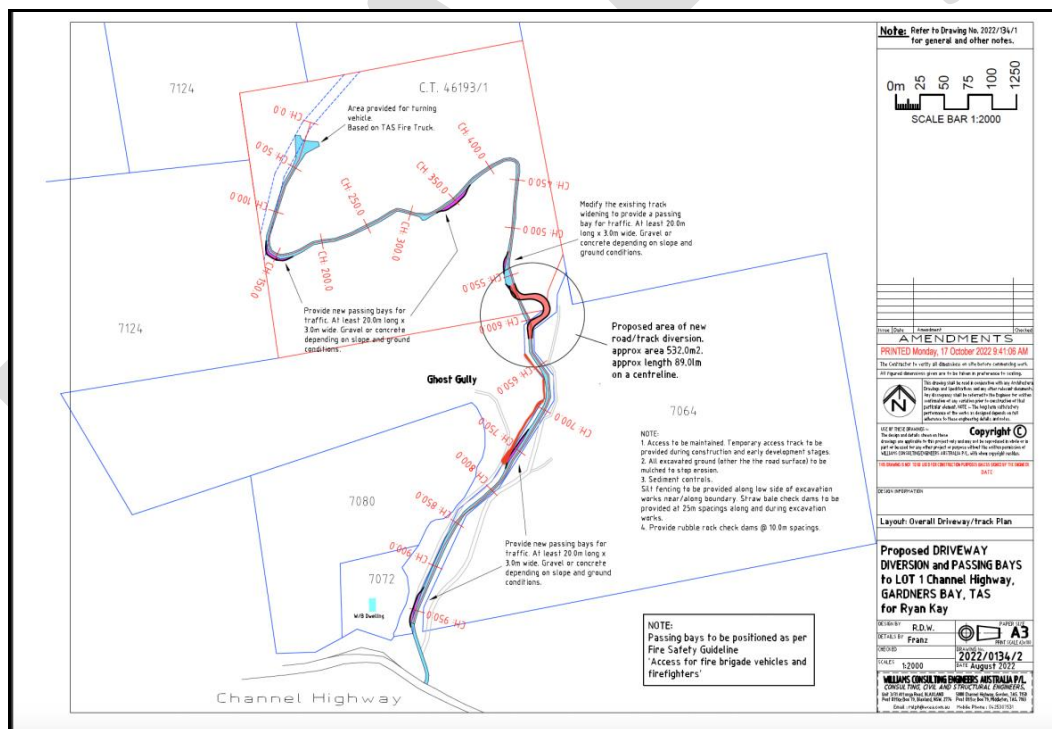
Site plan of proposed access via Reserve Road, alteration to access alignment in the south-east corner (circled), internal access and passing bays and location of proposed development site in the north-west corner, Channel Highway, Gardners Bay (Ref – Williams Consulting Engineers Australia P/L Drawing # 2022/0134/2).
